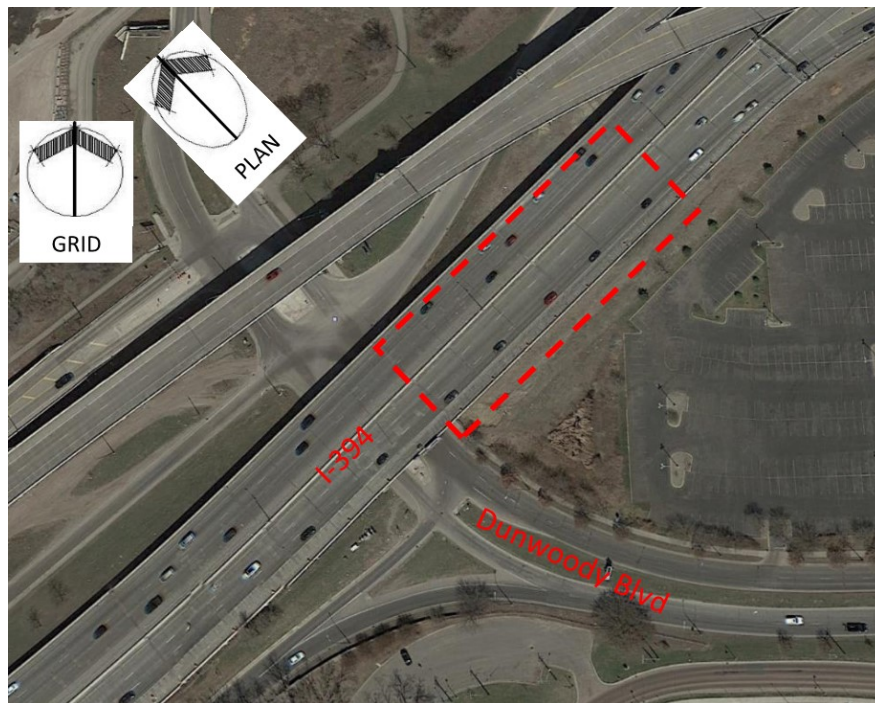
Aerial image of Bridge 27831 (obtained from Google® Earth)
